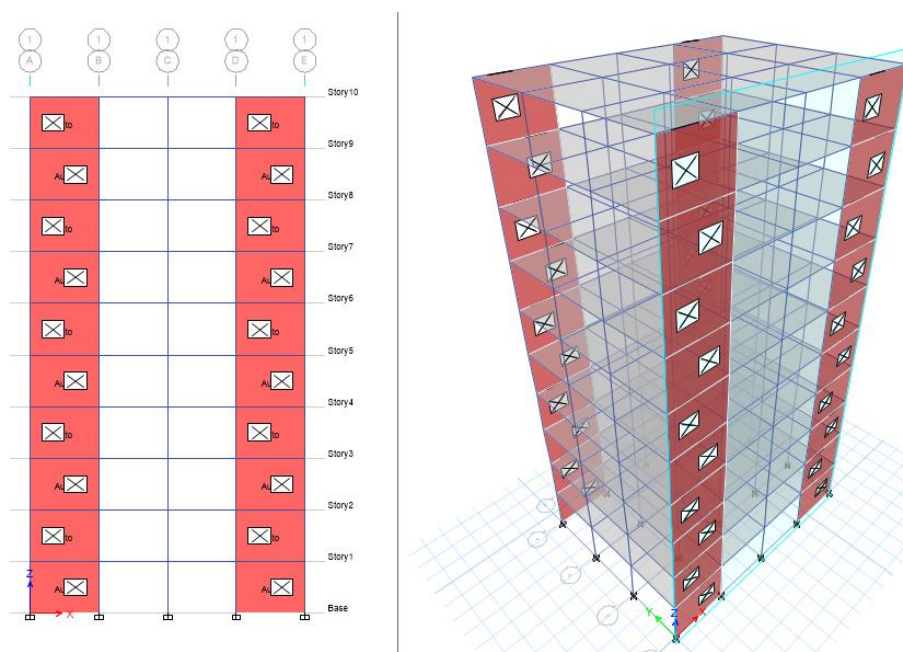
The 10-story building with concrete shear walls and with zigzag openings.
